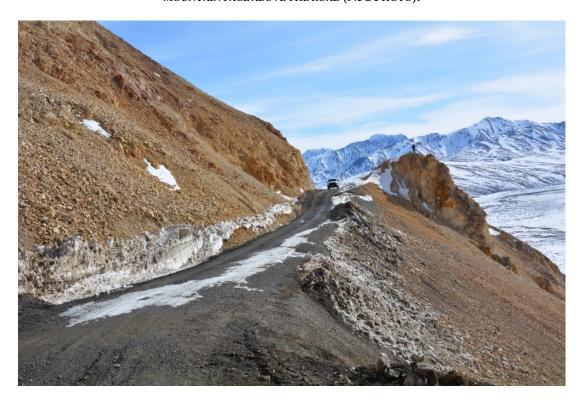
PRETTY ROCKS LANDSLIDE LOOKING EAST WITH SLUMPED/ CRACKED ROAD, APRIL 2015 (NPS PHOTO).
